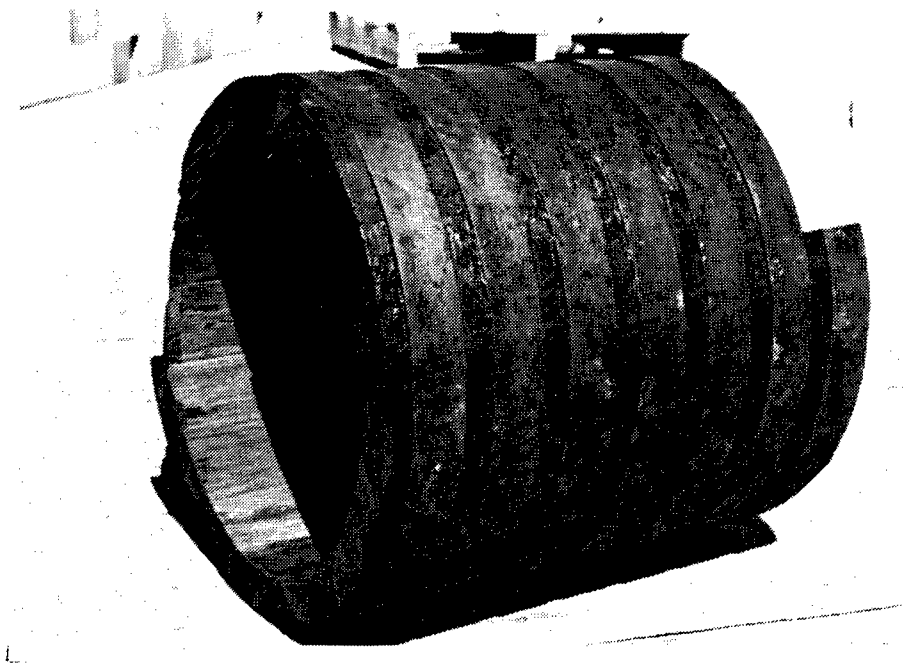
Building 1908: This wooden water pipe section with a 15- to 16-inch diameter was recovered from between buildings 407 and 409 and is believed to have carried water from the New River to the Water Pump House.
